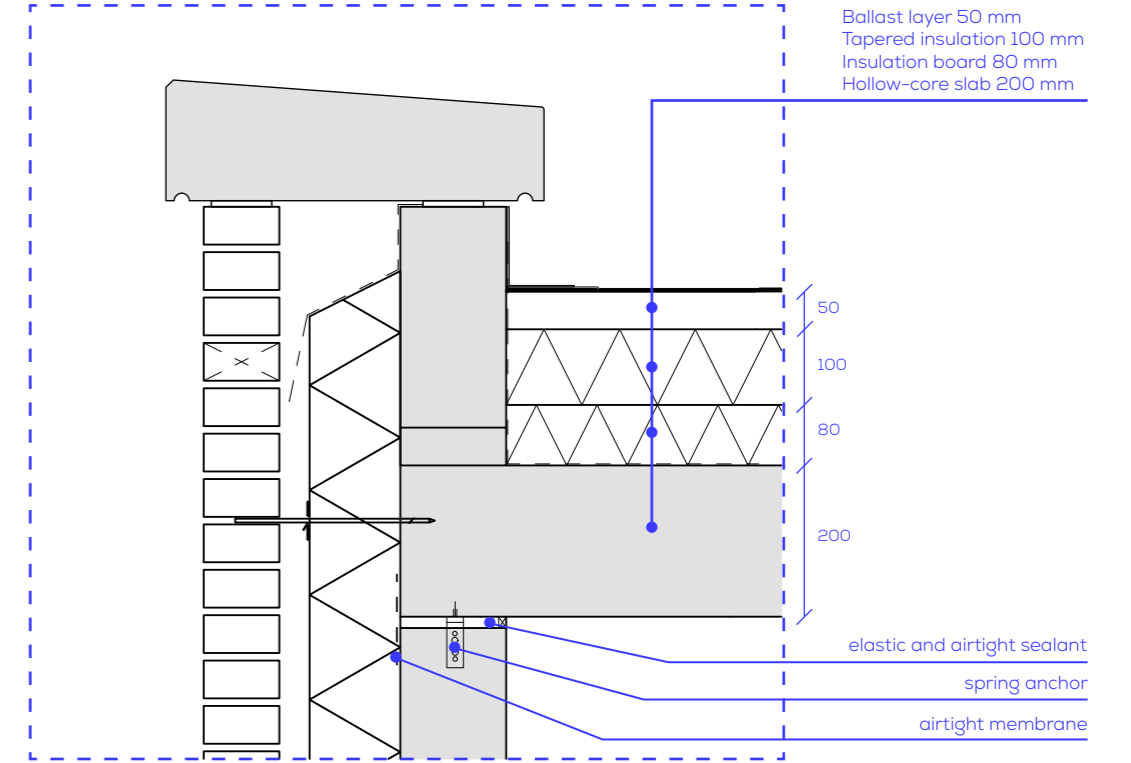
Vertical roof detail V.002, drawn on scale 1:5, scaled to 1:10
